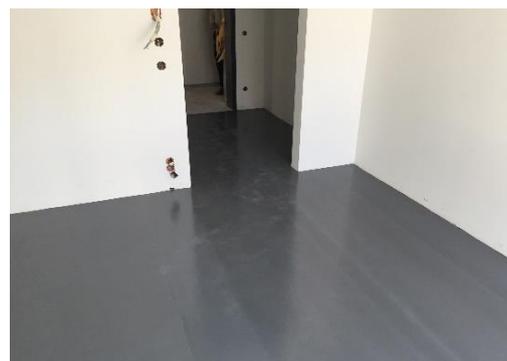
Stabilizing intermediate layer laid out floating on the SensFloor underlay
